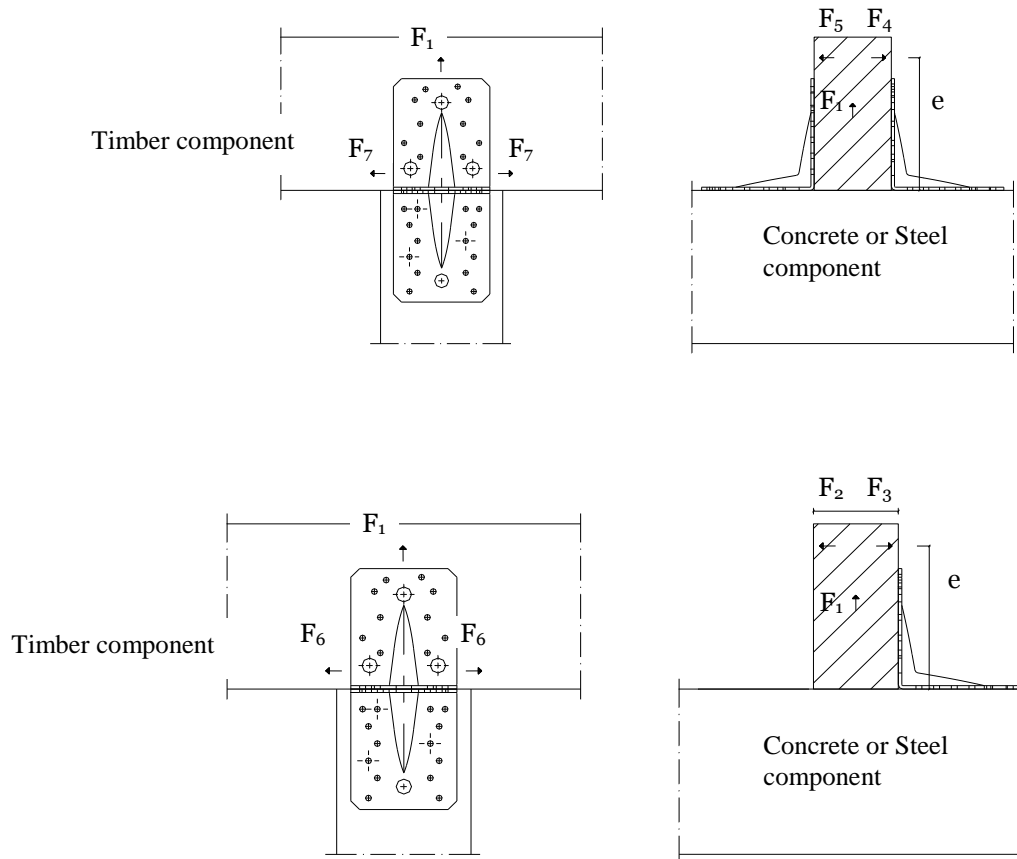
Definitions of forces, their directions and eccentricity for timber to concrete and timber to steel connections
